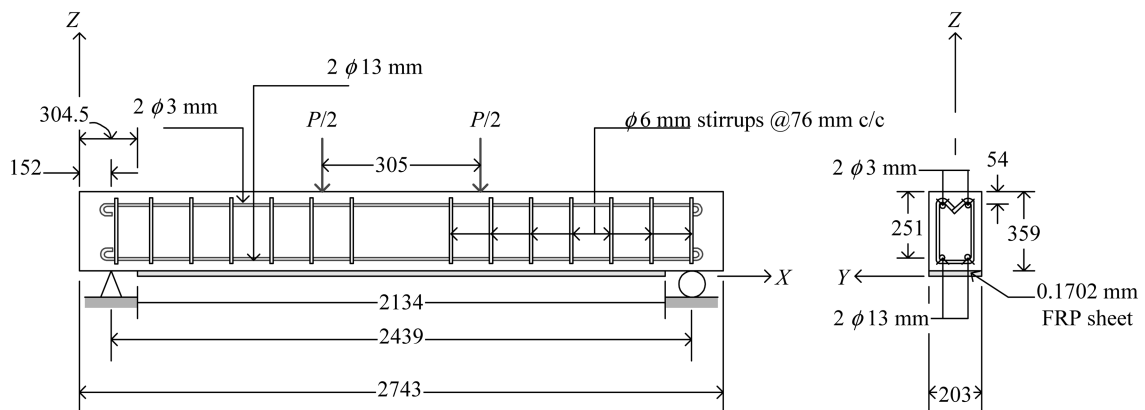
Geometry of a simply-supported beam under four-point load test (all dimensions are in mm)
